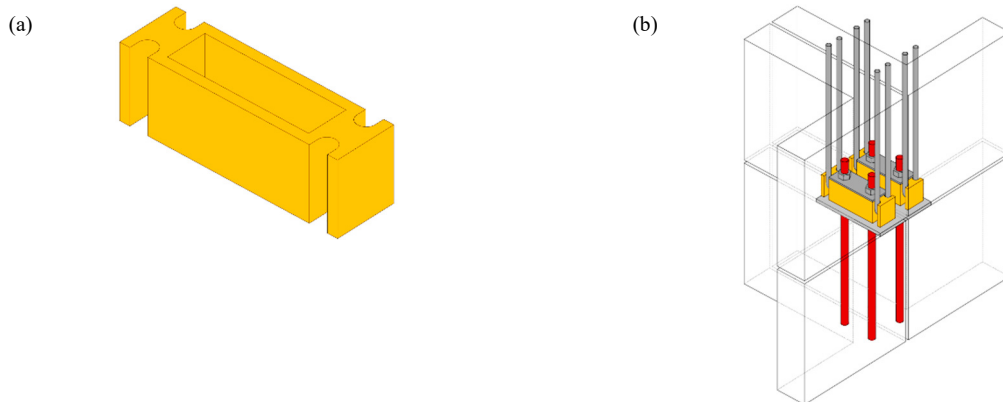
Conceptual sketch of the vertical connection system: (a) coupling plate cast in the upper element; (b) assembled joint.
